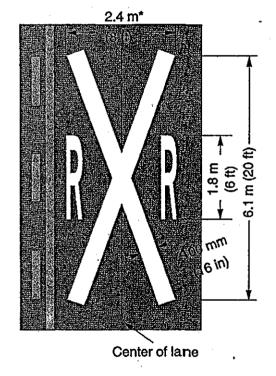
B-3. Typical Highway-Rail Grade Crossing Pavement Mærkings
